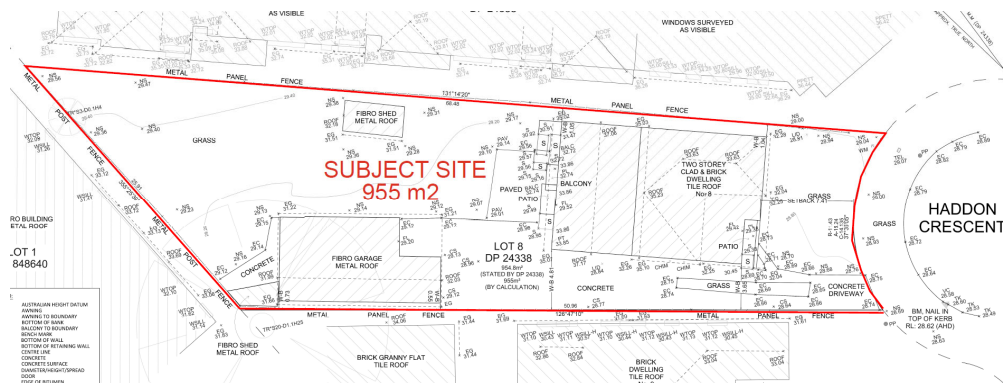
Site area of subject site is 955m<sup>2</sup> in accordance with latest survey plan provided by C&A surveyors.
